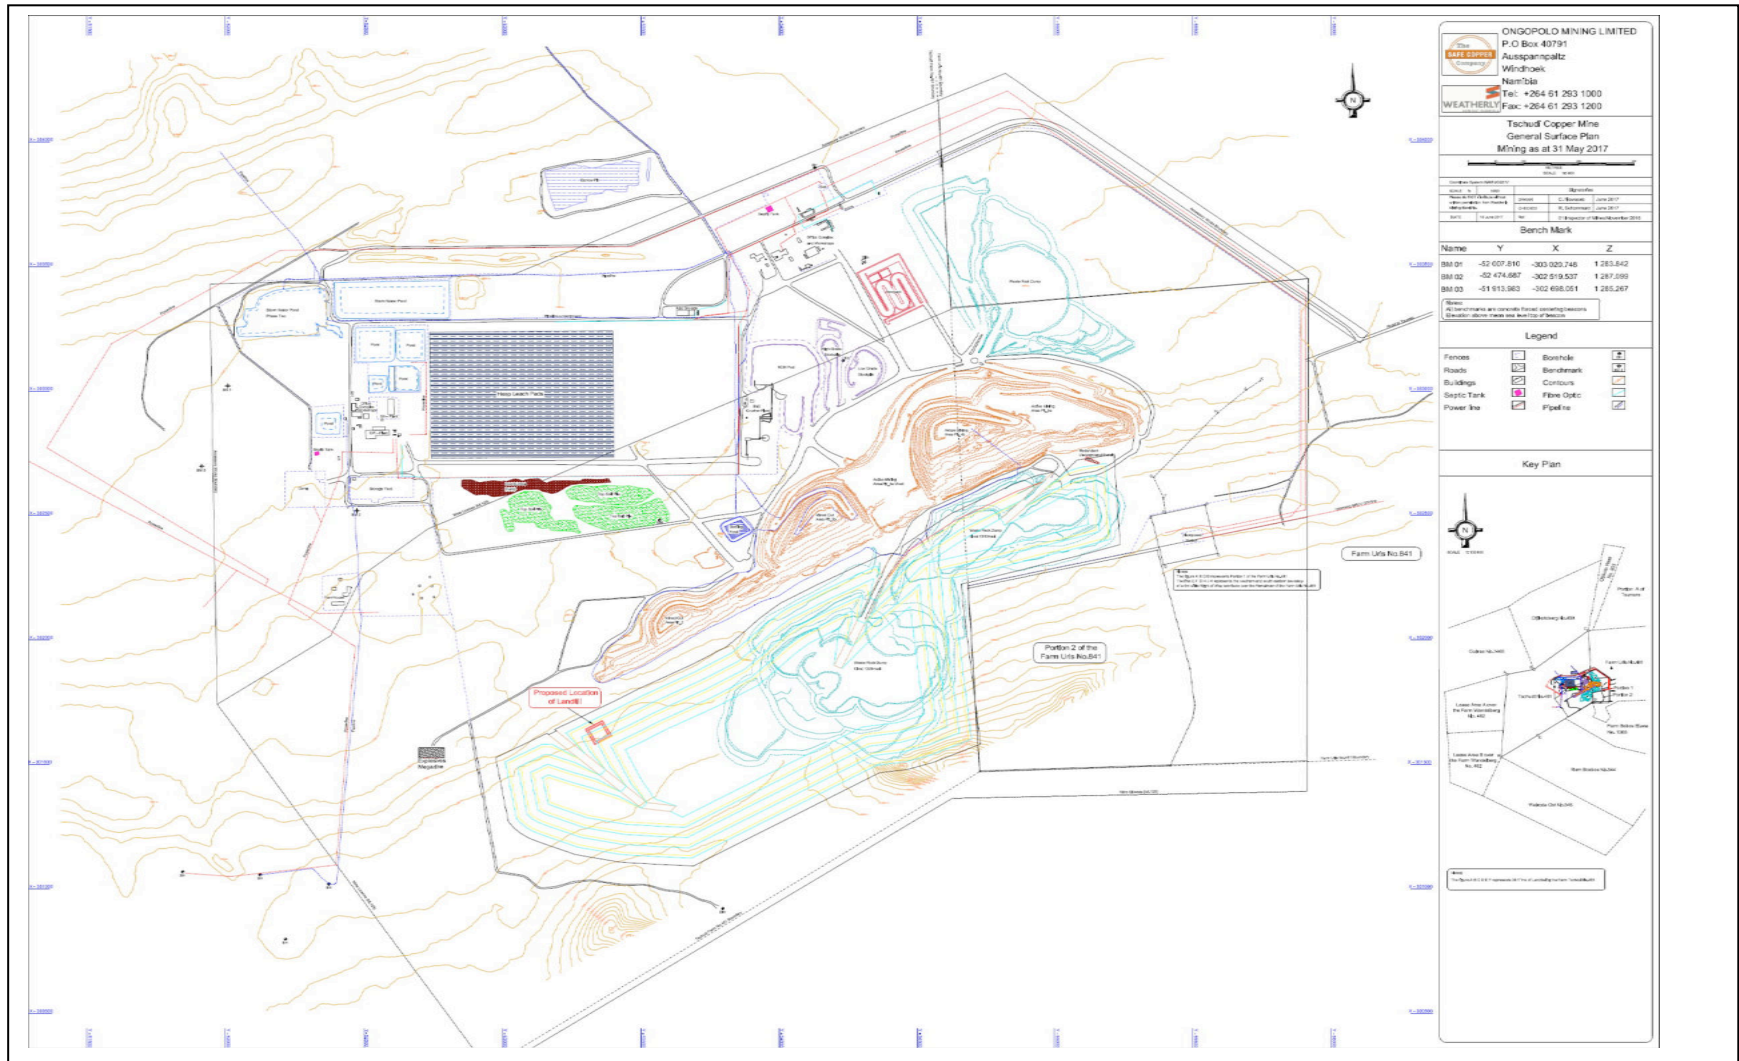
TSCHUDI COPPER MINE INFRASTRUCTURE DESIGN PLAN WITH THE PROPOSED WASTE DISPOSAL FACILITY ON THE WASTE ROCK DUMP
